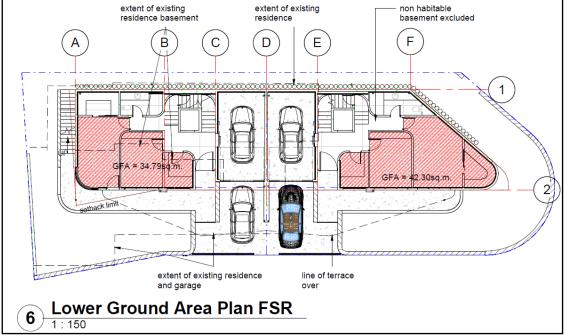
Lower Ground Area Plan FSR. Source: Submitted Architectural Plans
